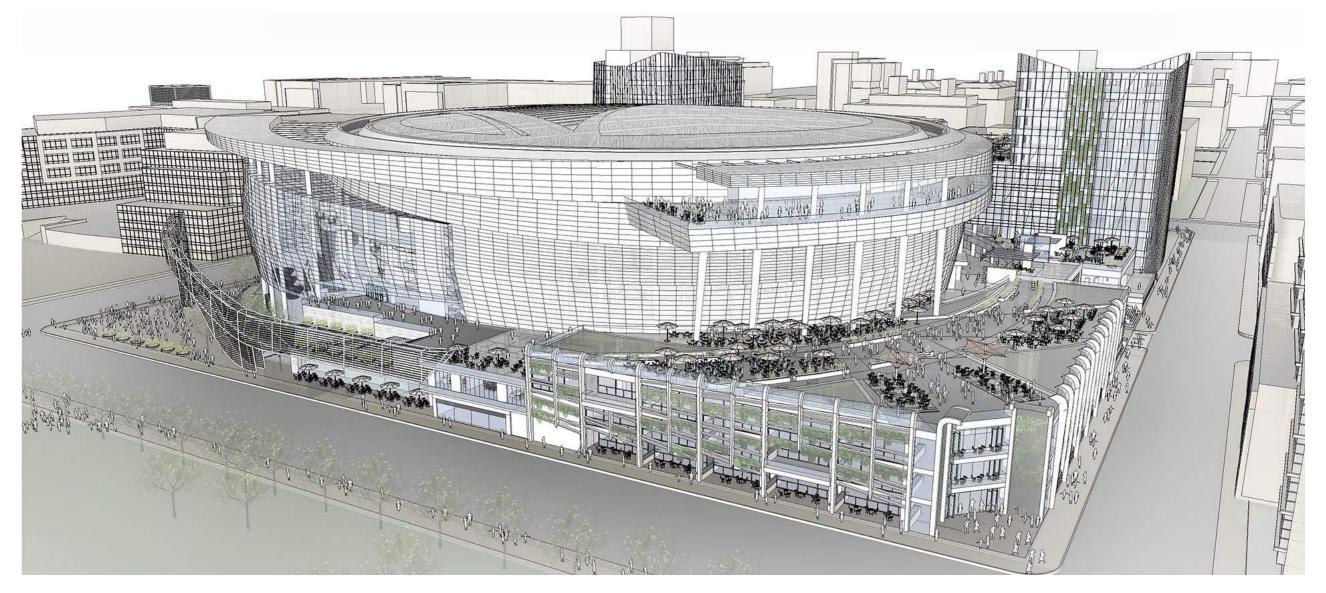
Concept Sketch from Northeast Corner – Food Hall and Bayfront Terrace
